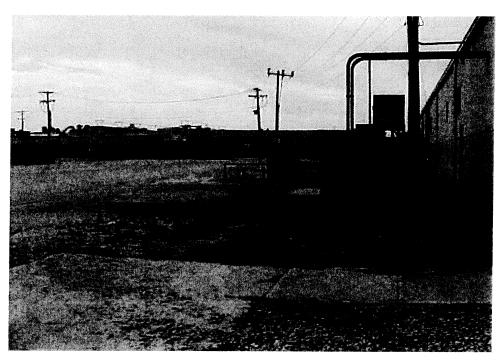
LOCATION: Facing southwest DESCRIPTION: View of exterior of the building and property
